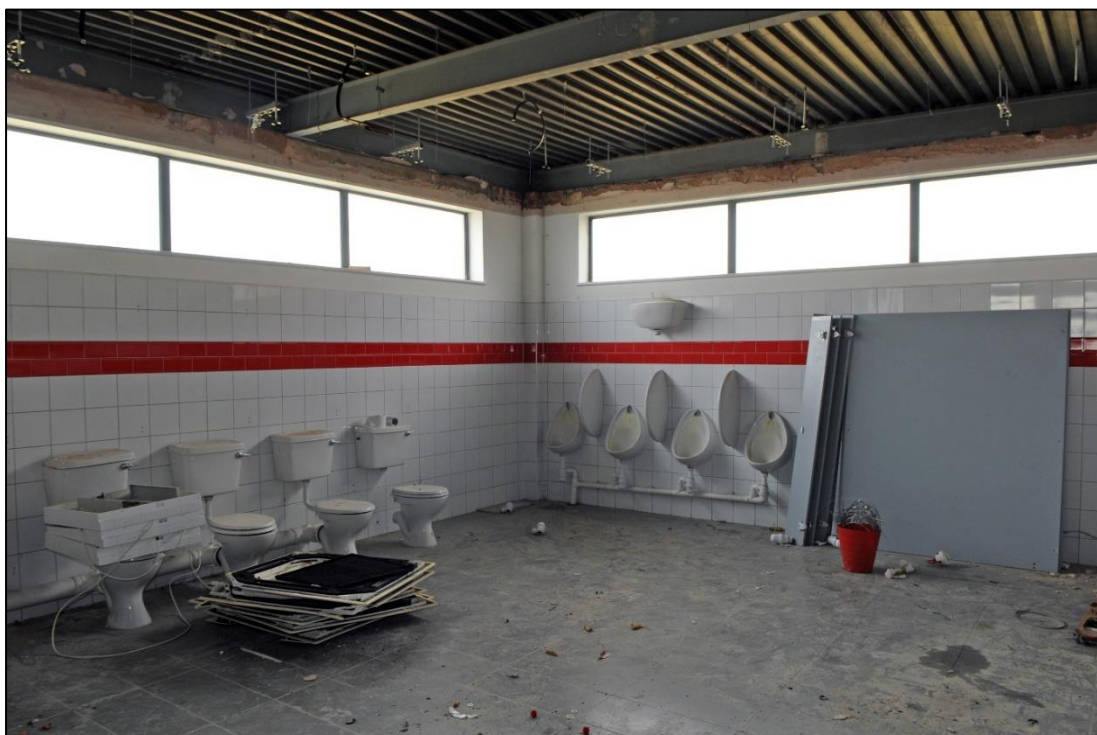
Detail of toilets in north-eastern corner of Building 1 (image 0070).
